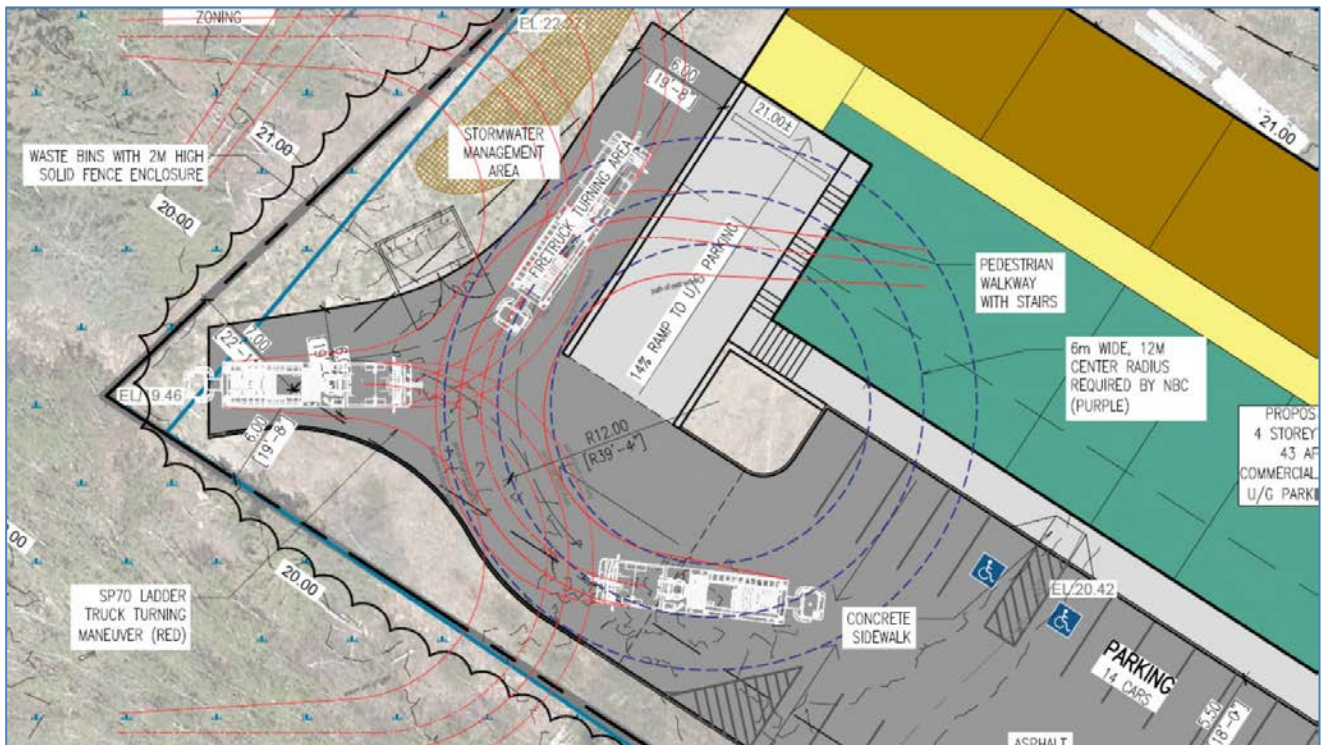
Revised Site plan with Turning Area for Fire Trucks
